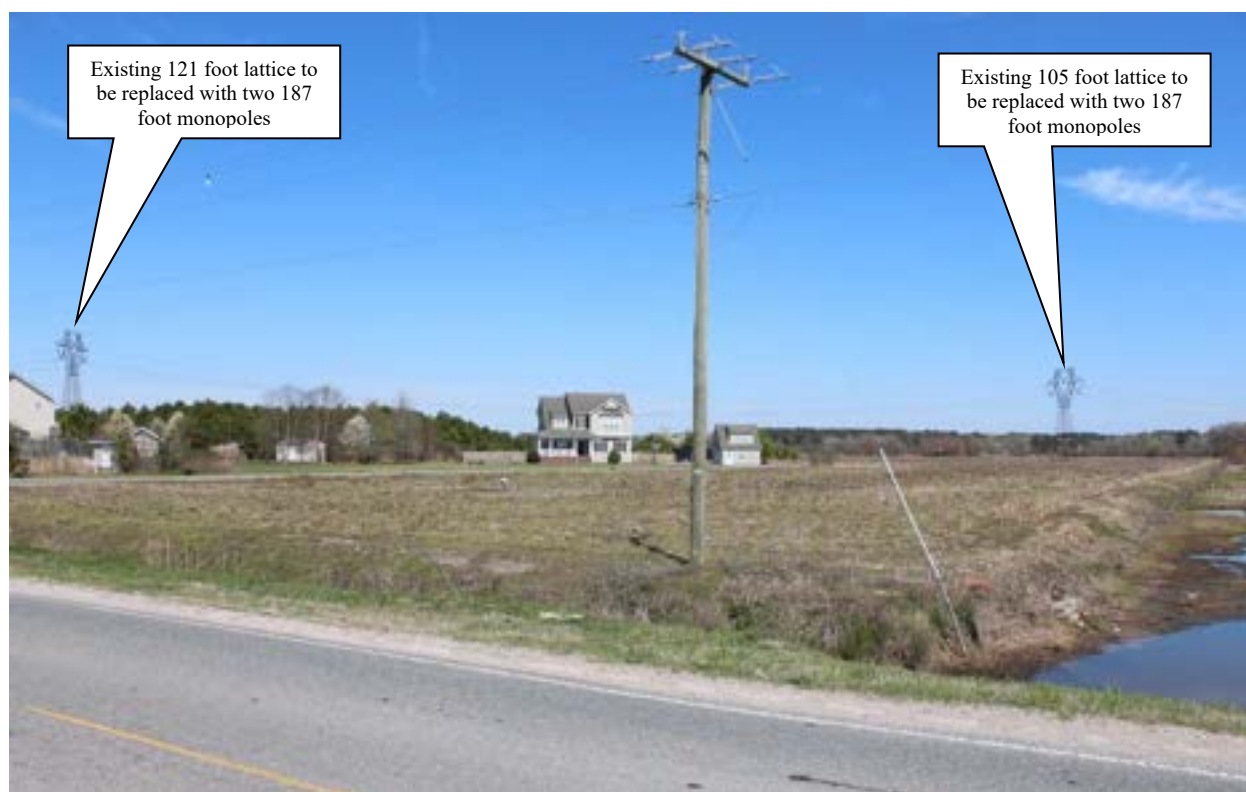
Photo location 2- View from Herring Canal at Shillelagh Road, facing northeast. (multiple existing structures visible across open field)
